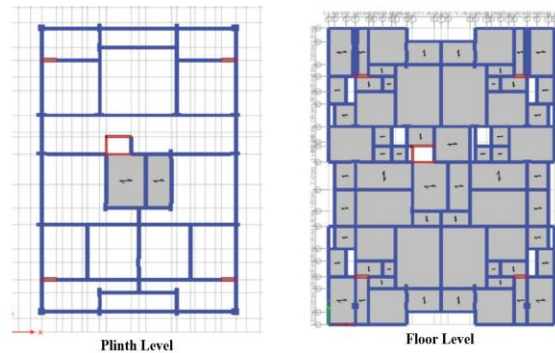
Plan configuration and floor-level column layout considered for alternate load-path assessment.
